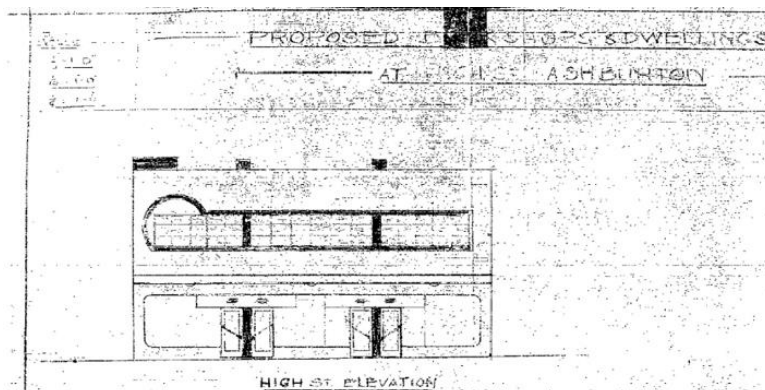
Detail of original architectural drawings for 174-178 High Street, Ashburton, showing the main elevation to High Street. Drawings by G James, dated 1950 (Source: City of Camberwell building permit plans).
